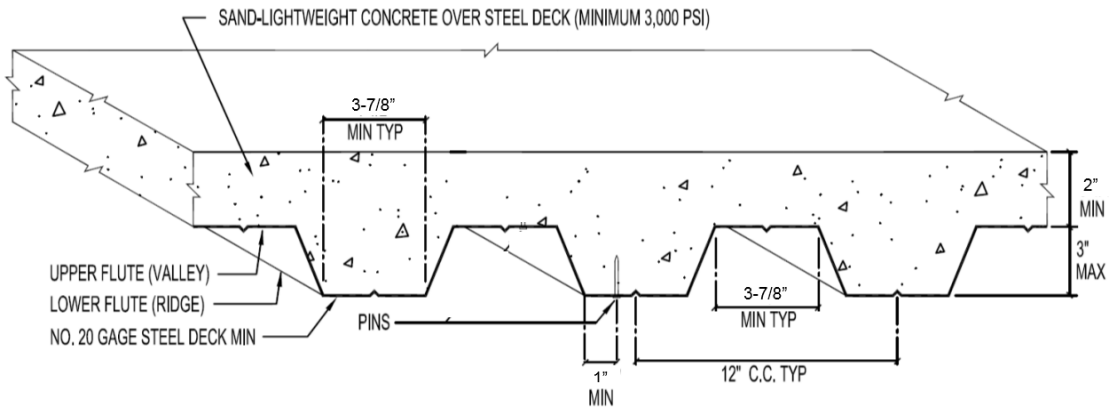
B—CONFIGURATION OF CONCRETE FILLED 3-INCH DEEP STEEL DECK (LOWER FLUTE INSTALLATIONS)
